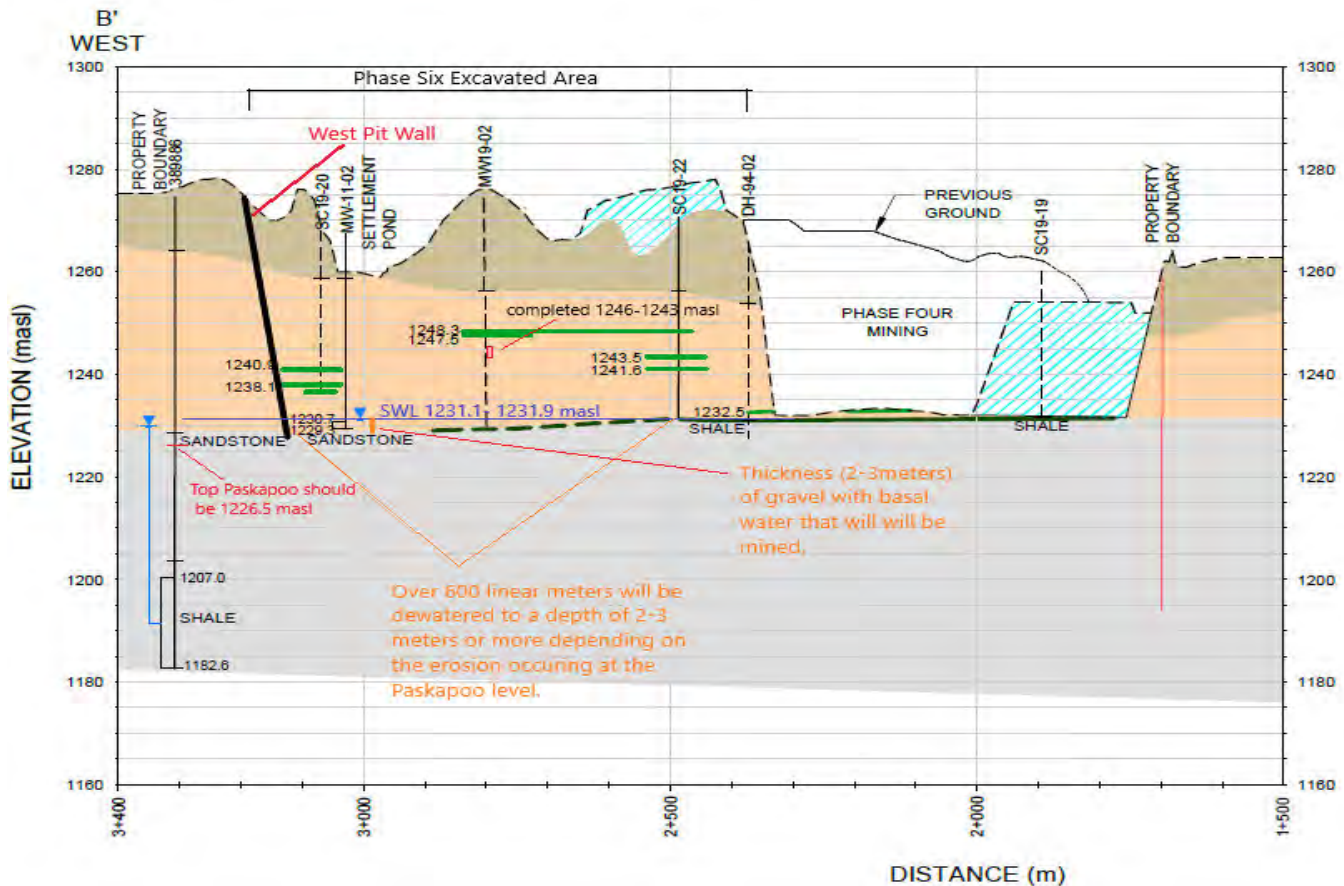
(above) AECOM cross section B-B' (Fig. 13 in the HTA) showing Phase 6 mining area and where extensive dewatering will occur
